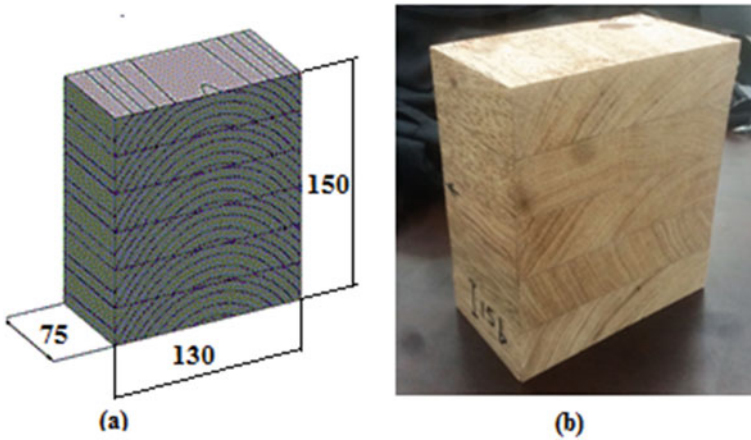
Dimension of Mengkulang timber, a dimension of width, length, and height, b the real dimension
